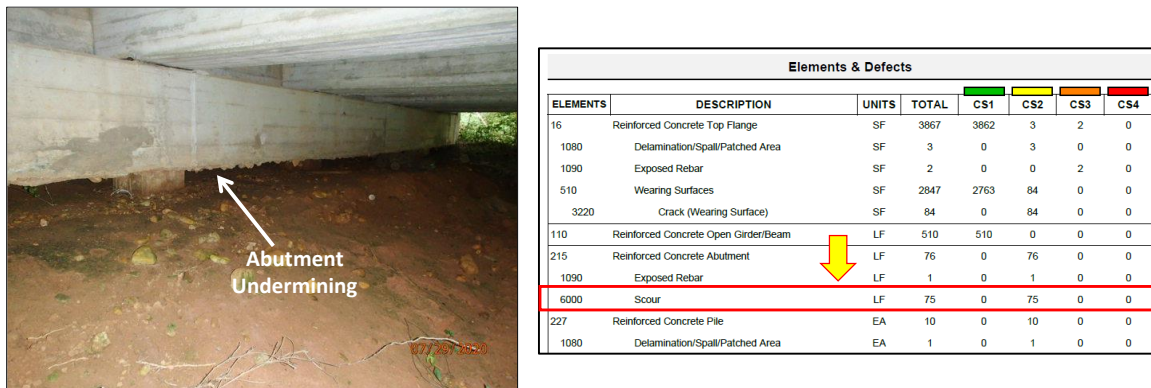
Illustration. Example of Vertical Concrete Element Defect Entry.
